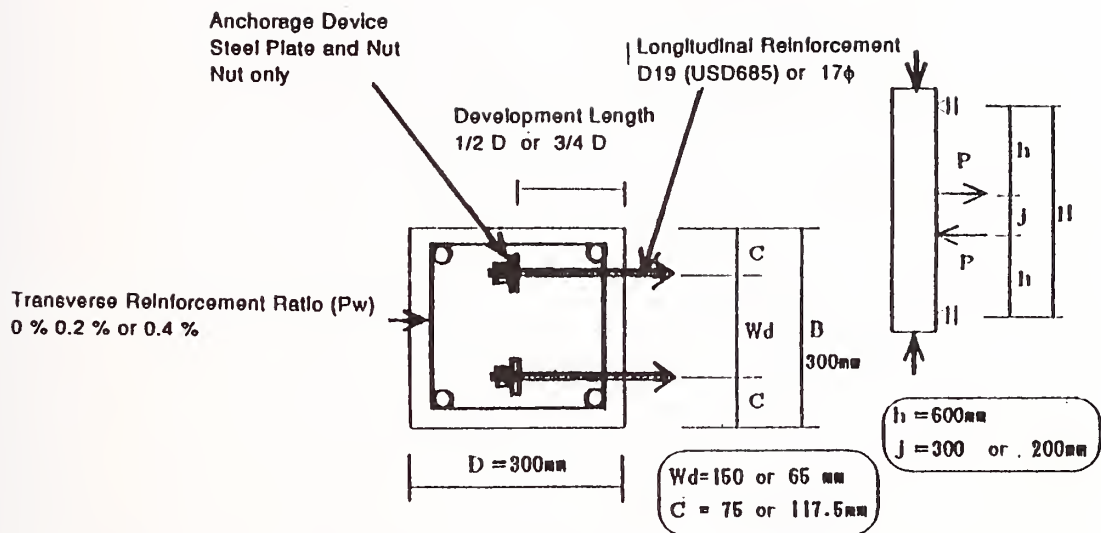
Tensile Strength Test of Plate Anchorage Developed in Exterior Beam Column Joint
